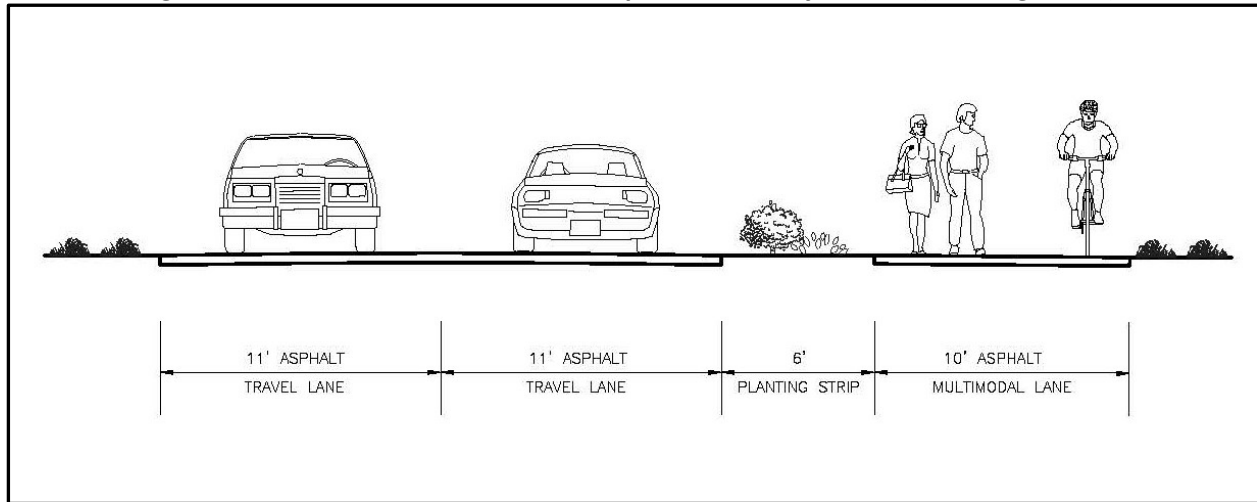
Akoko Street Extension - Proposed Roadway Layout
